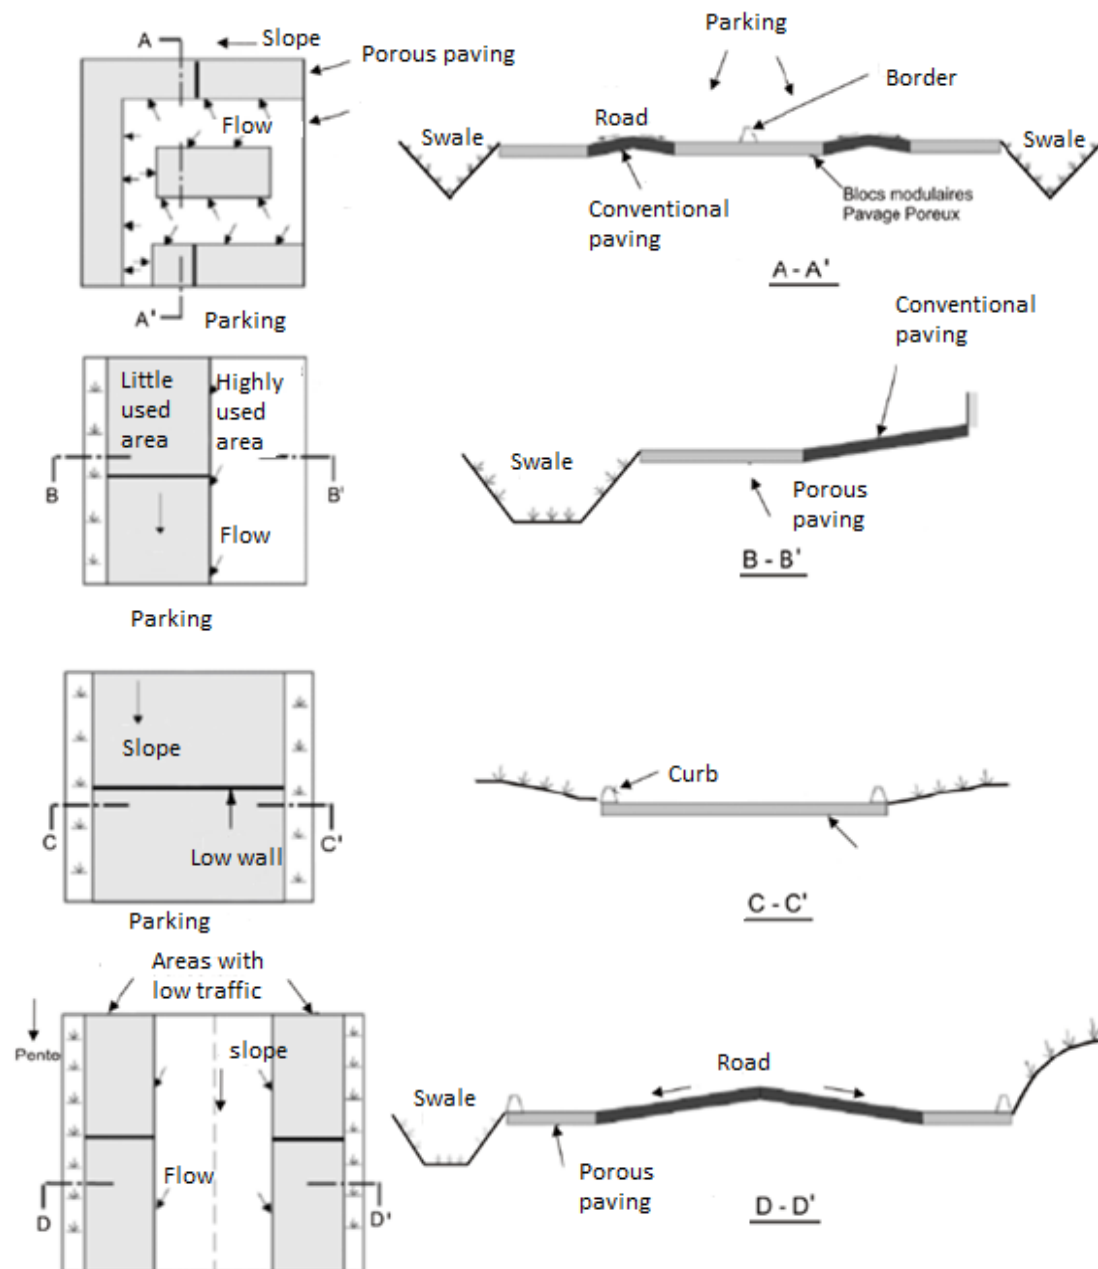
Design concepts with porous floor cladding (adapted from Denver, 2005)
